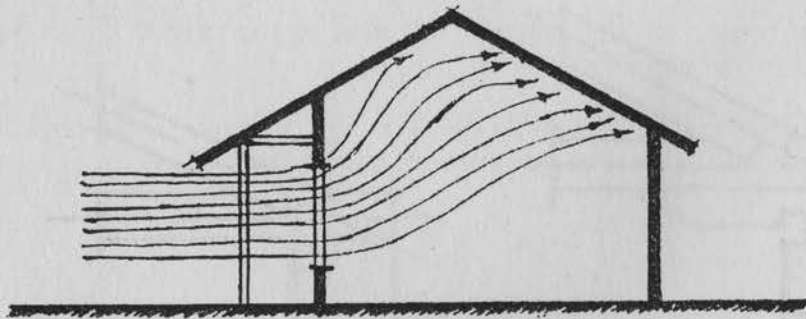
Roofs without ceilings under them are likely to be blown up by strong wind.
